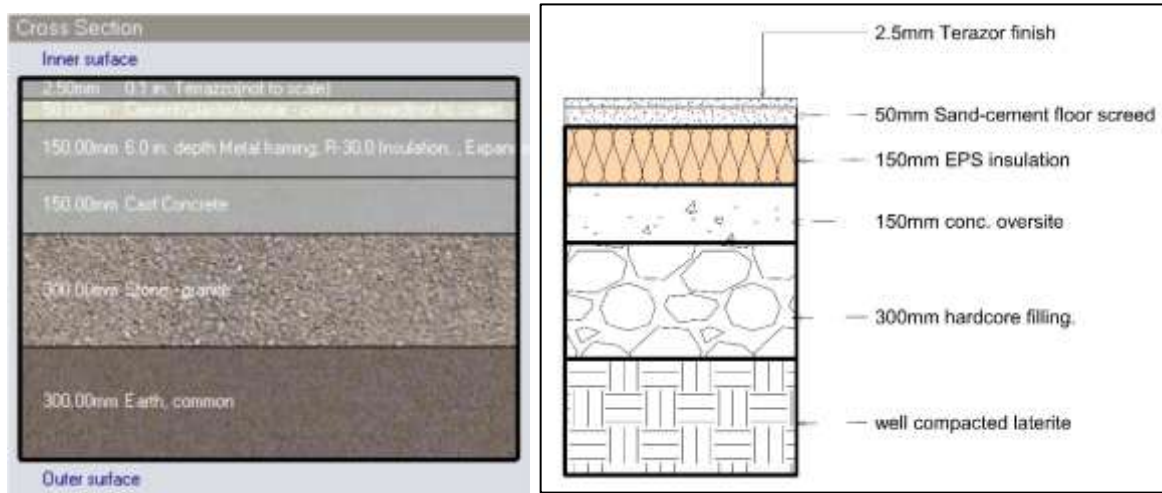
Cross Section of the Improved Ground Floor (Authors Sketch; Design Builder).
